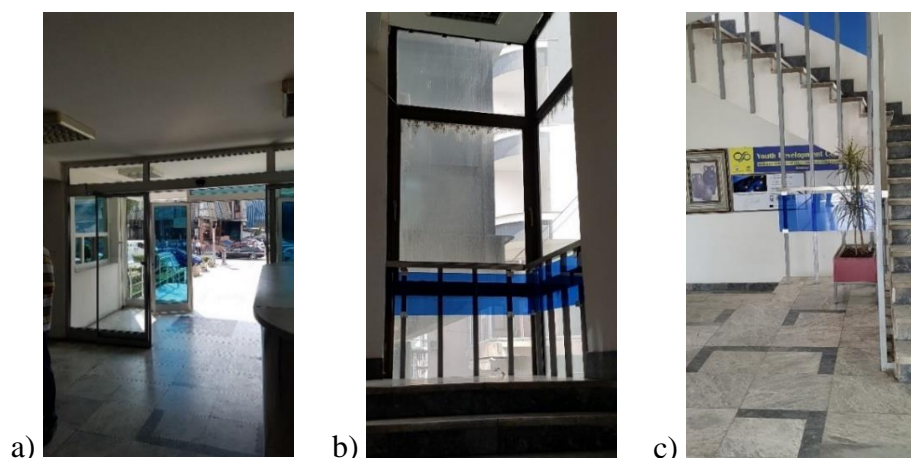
Gostivar RLG Building, internal appearance: a) entrance door, b) external openings, c) central hall (photo taken: 17.8.2017)
